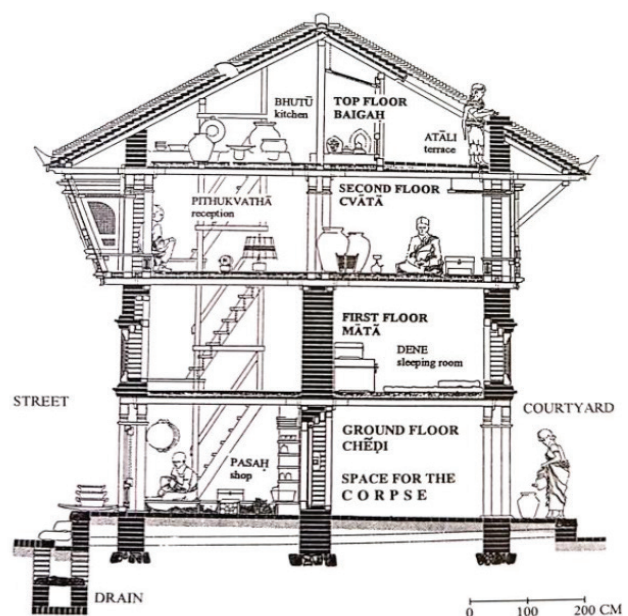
Section of a traditional Newari Building (Gutschow, 1987)
